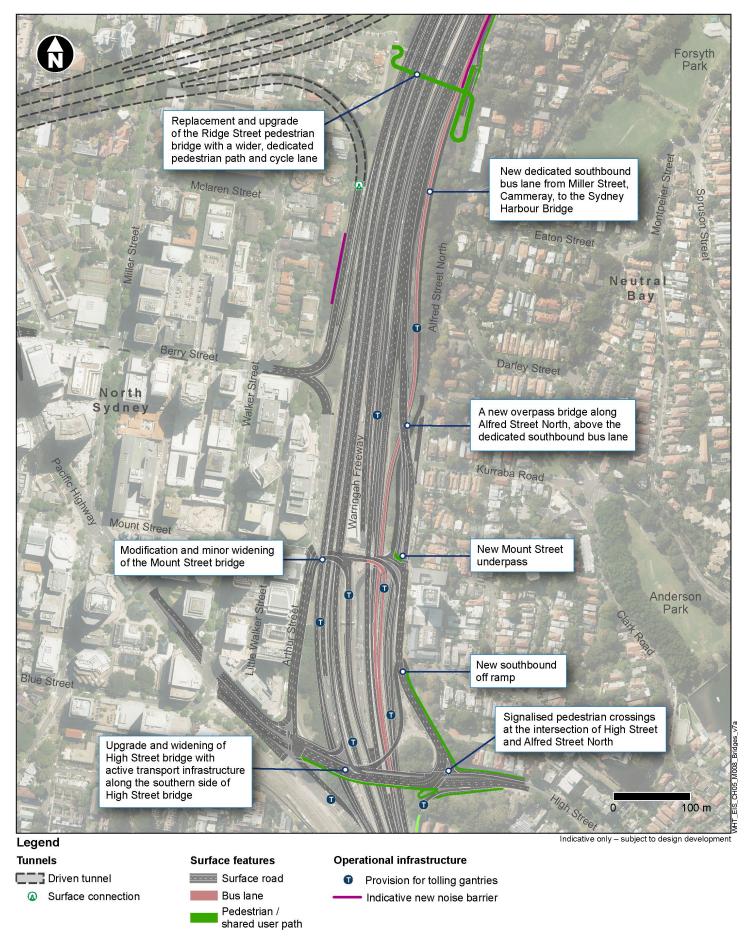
New, modified and relocated road bridges of the Warringah Freeway Upgrade component (map 1)
